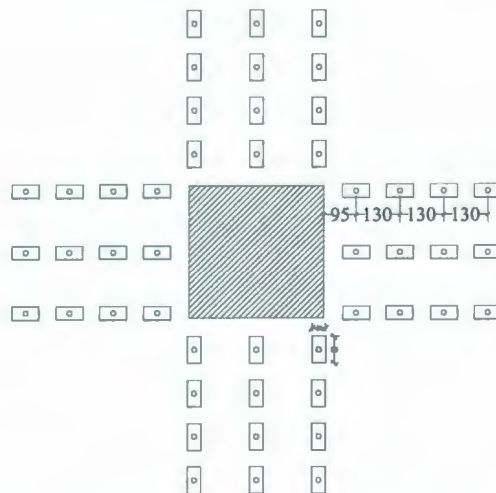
Arrangement of T-headed minimum shear reinforcement for slab HS6
